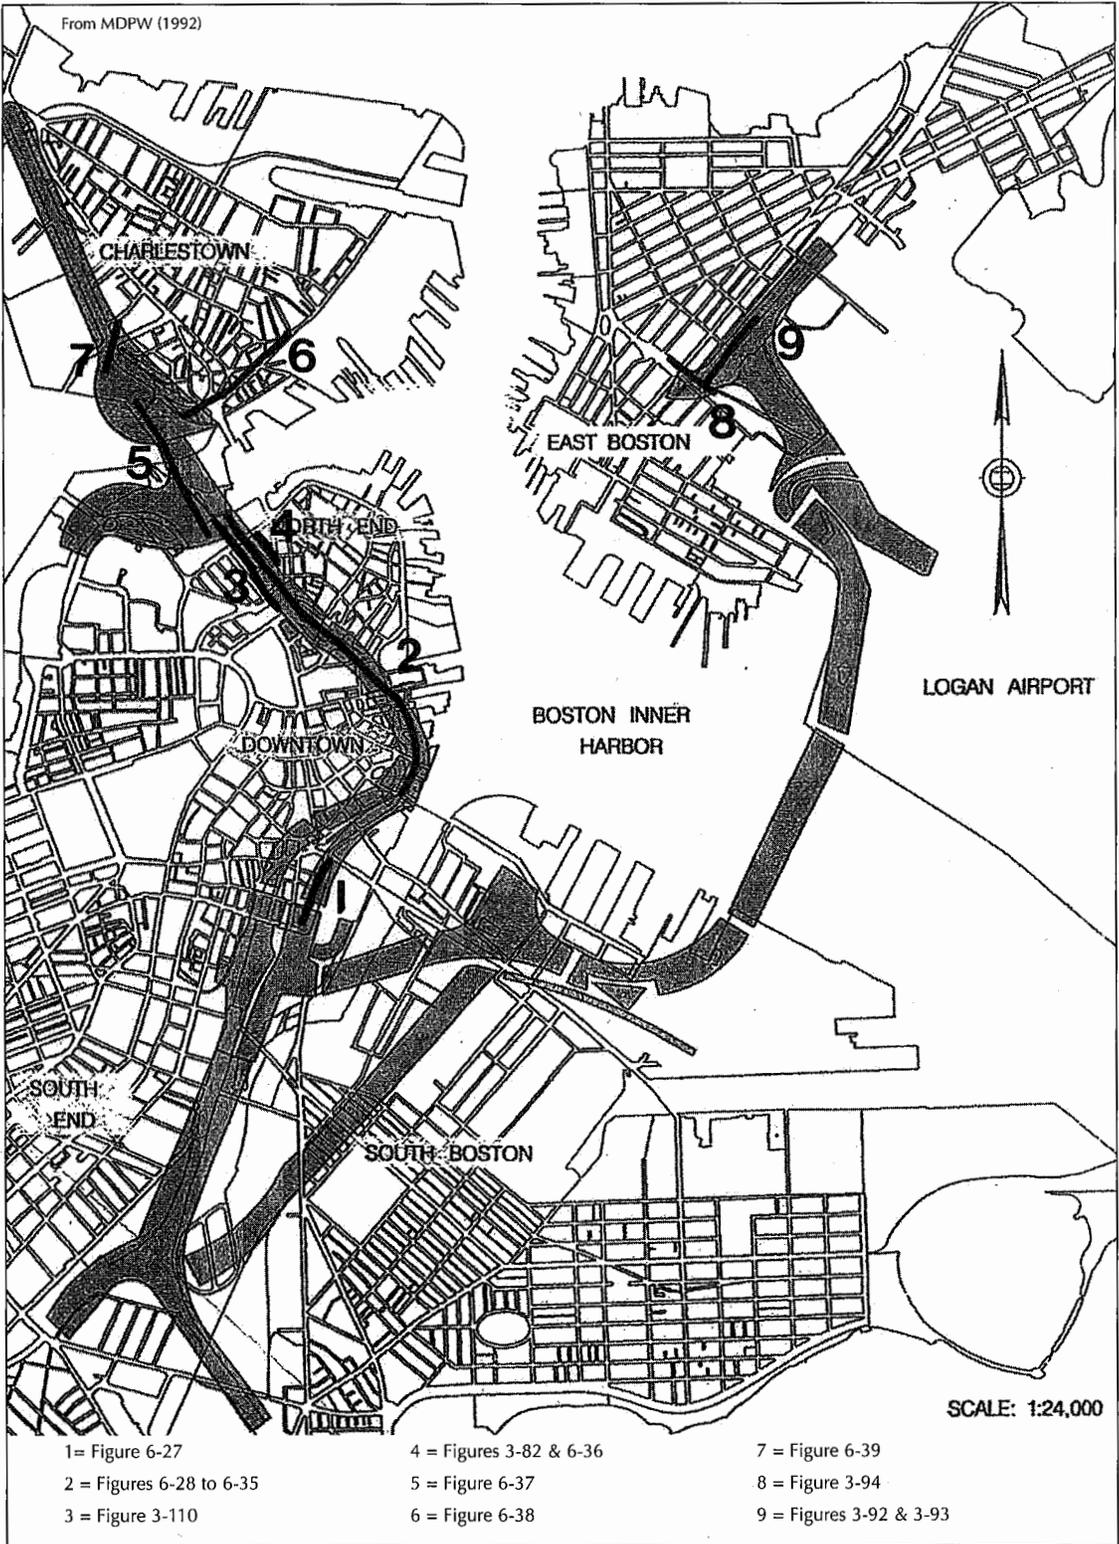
Plan of the Central Artery/Tunnel Project showing sites of sections.
